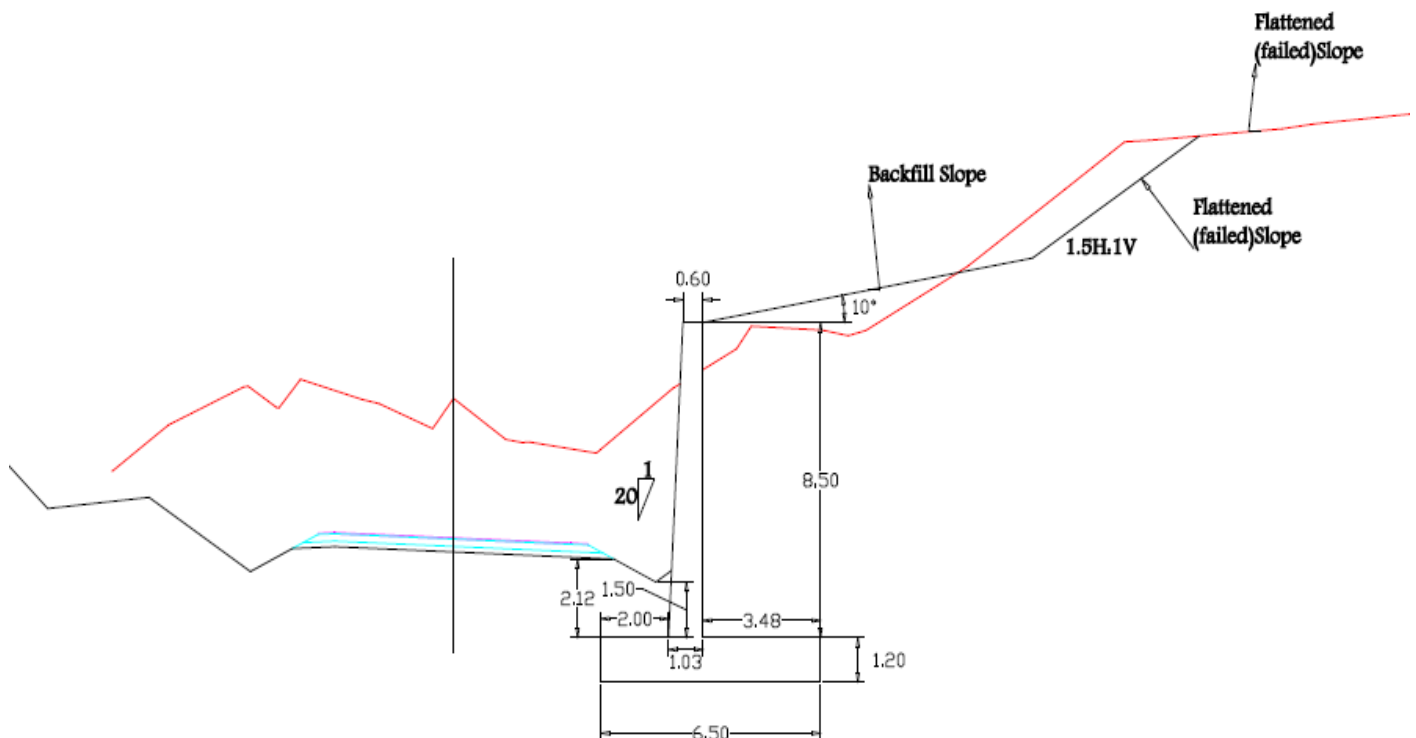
Tentative dimensions of retaining wall and Flattened Slide Material
